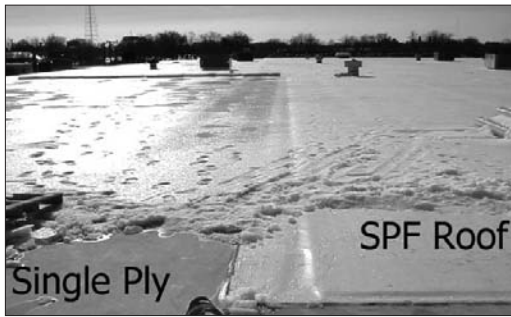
A cool roof in Connecticut shows less snowmelt on the right, where SPF insulation has reduced the heat transfer from the building
